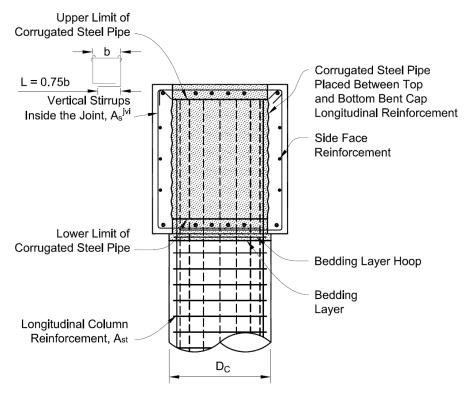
Cap Pocket Joint Shear Reinforcement Details (Section)—SDC A
